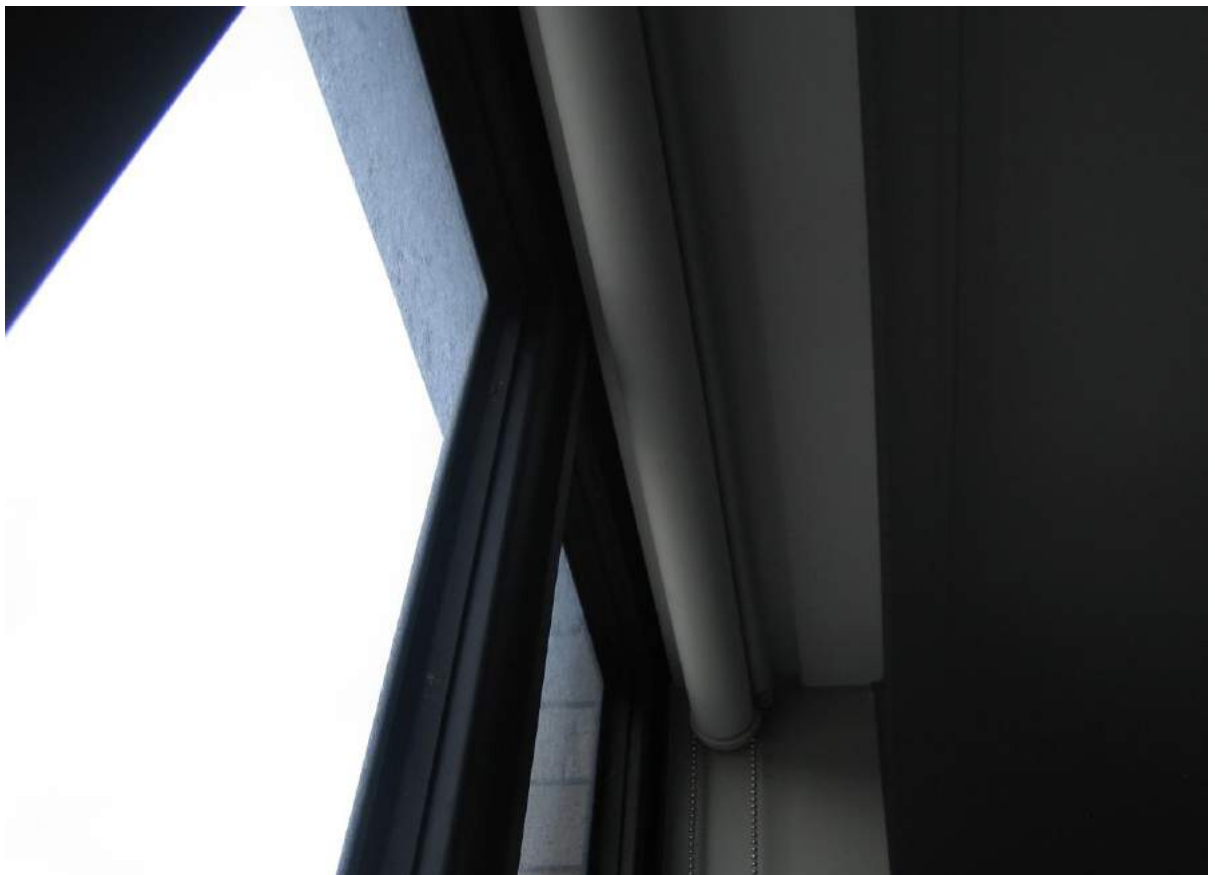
Water penetration emanating from head of window in bedroom 2 in Unit 301.
